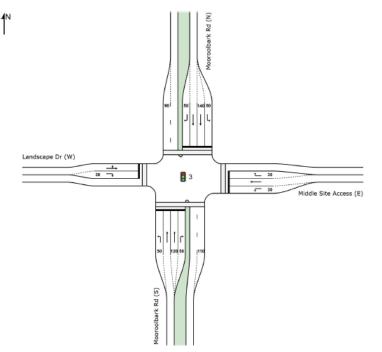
Mooroolbark Rd / Site Access / Landscape Dr Post Development Intersection Layout
